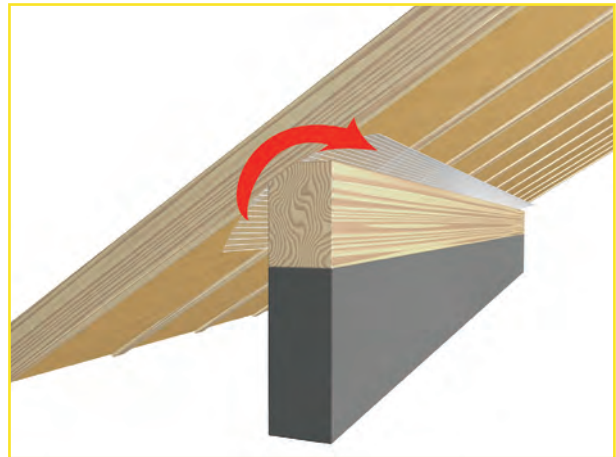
Option – Transition from facade to roof, outside to inside, between purlin and rafters.
